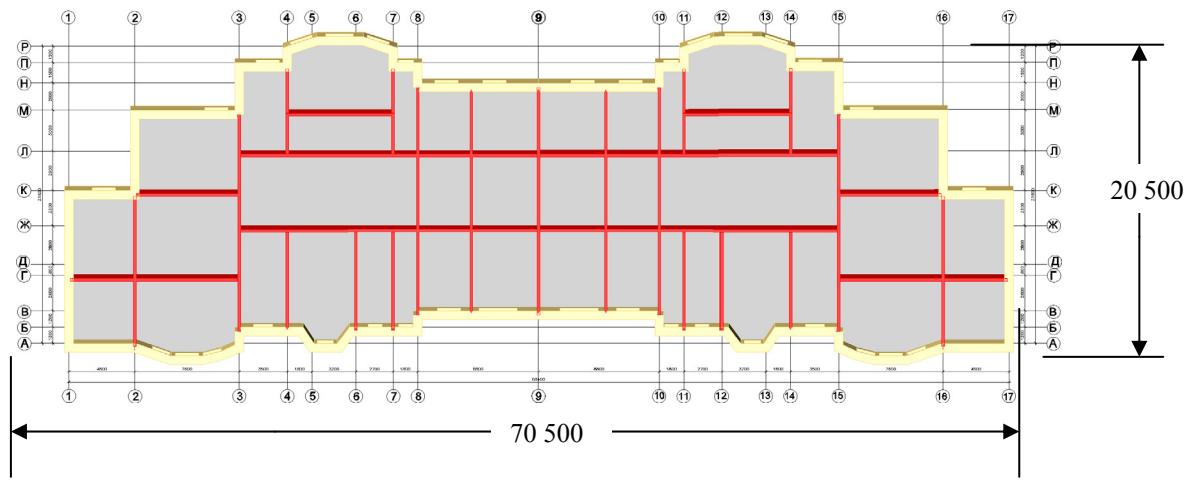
A typical floor plan (internal bearing reinforced concrete walls 200 mm thick indicated in red, external bearing brick walls 640 mm thick indicated in yellow)
